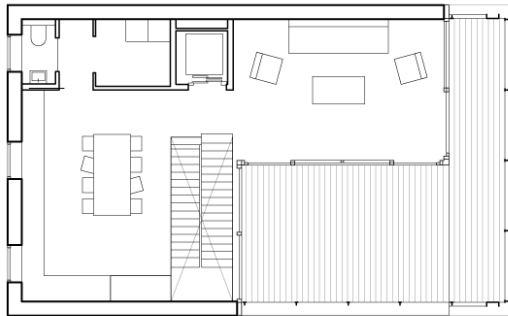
Third floor plan. Photo by BETA Architects (www.beta-office.com/project/3-generation_house)
